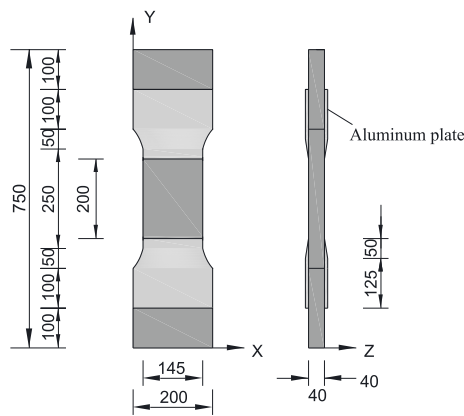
Specimen strengthened with aluminum plates (unit: mm).
